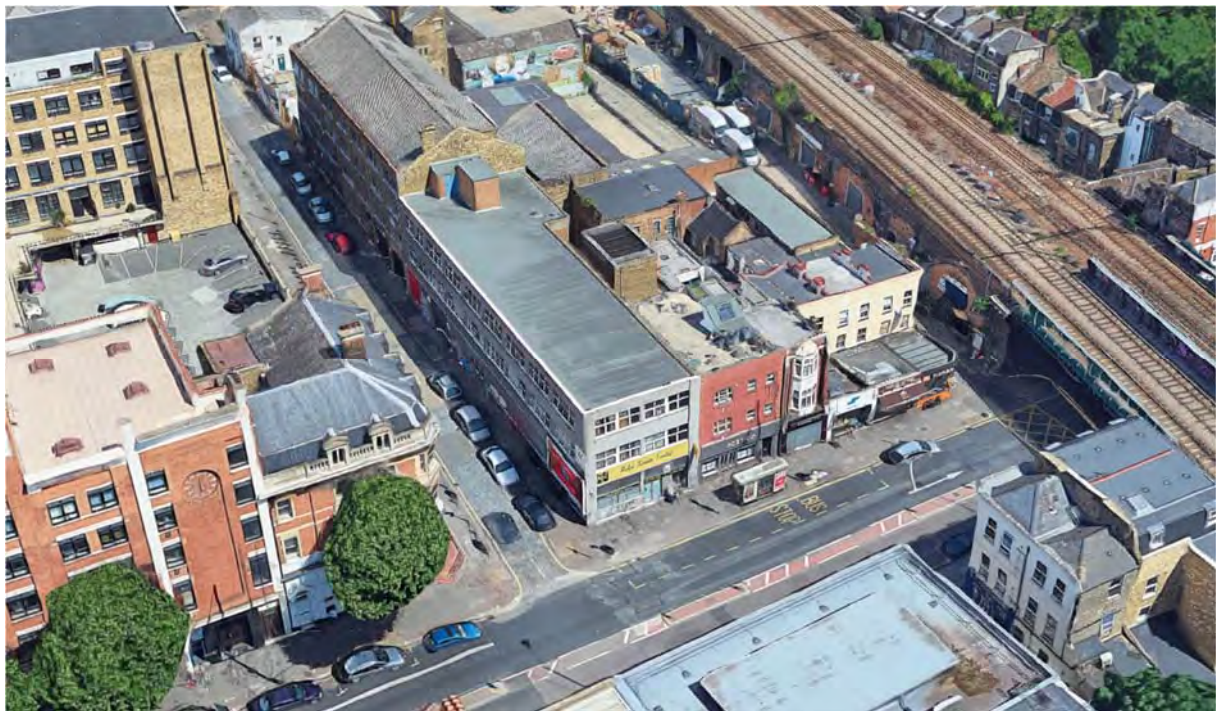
Aerial photo of the site and surrounding buildings (© Google)
